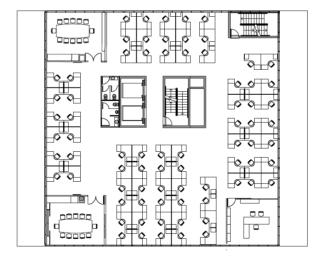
Floor plan of office floors, L1-L2. Half of the first floor consists of library, while the 6th and 7th floor are connected by an open internal staircase in the lower left corner.
